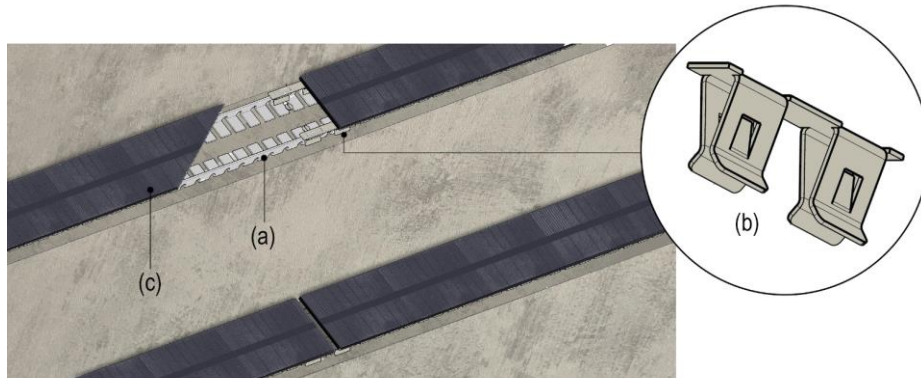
Anchors and connections detail: (a) pair of comb-shaped metal profiles with an L-formed cross section; (b) bearing brackets; (c) solar strings (authors' elaboration) © 2024, Paolo Piantanida, Antonio Vottari
